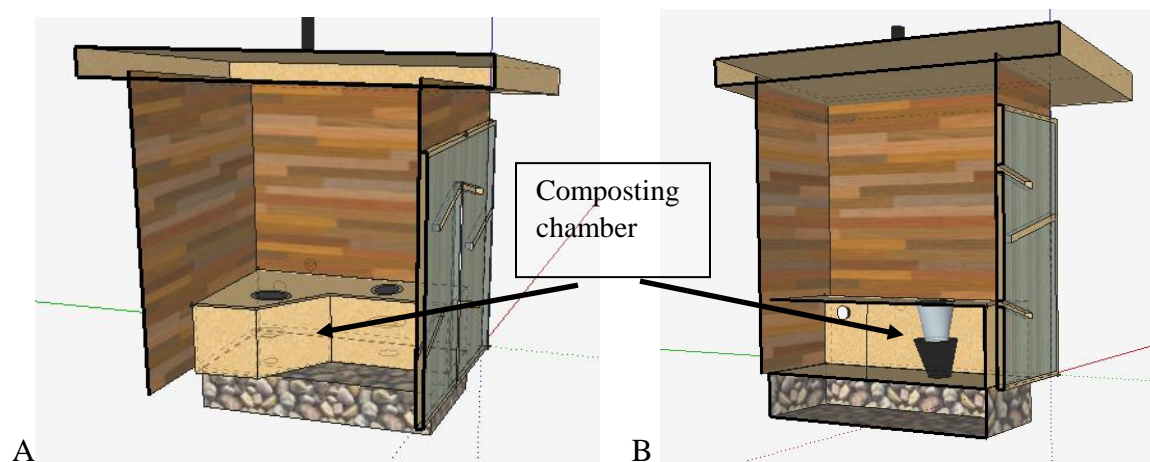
Drawings of the views inside the room and composting chamber. A - Cross sectional view of the room B - Cross sectional view of one of the collecting buckets and the exhaust fan.
